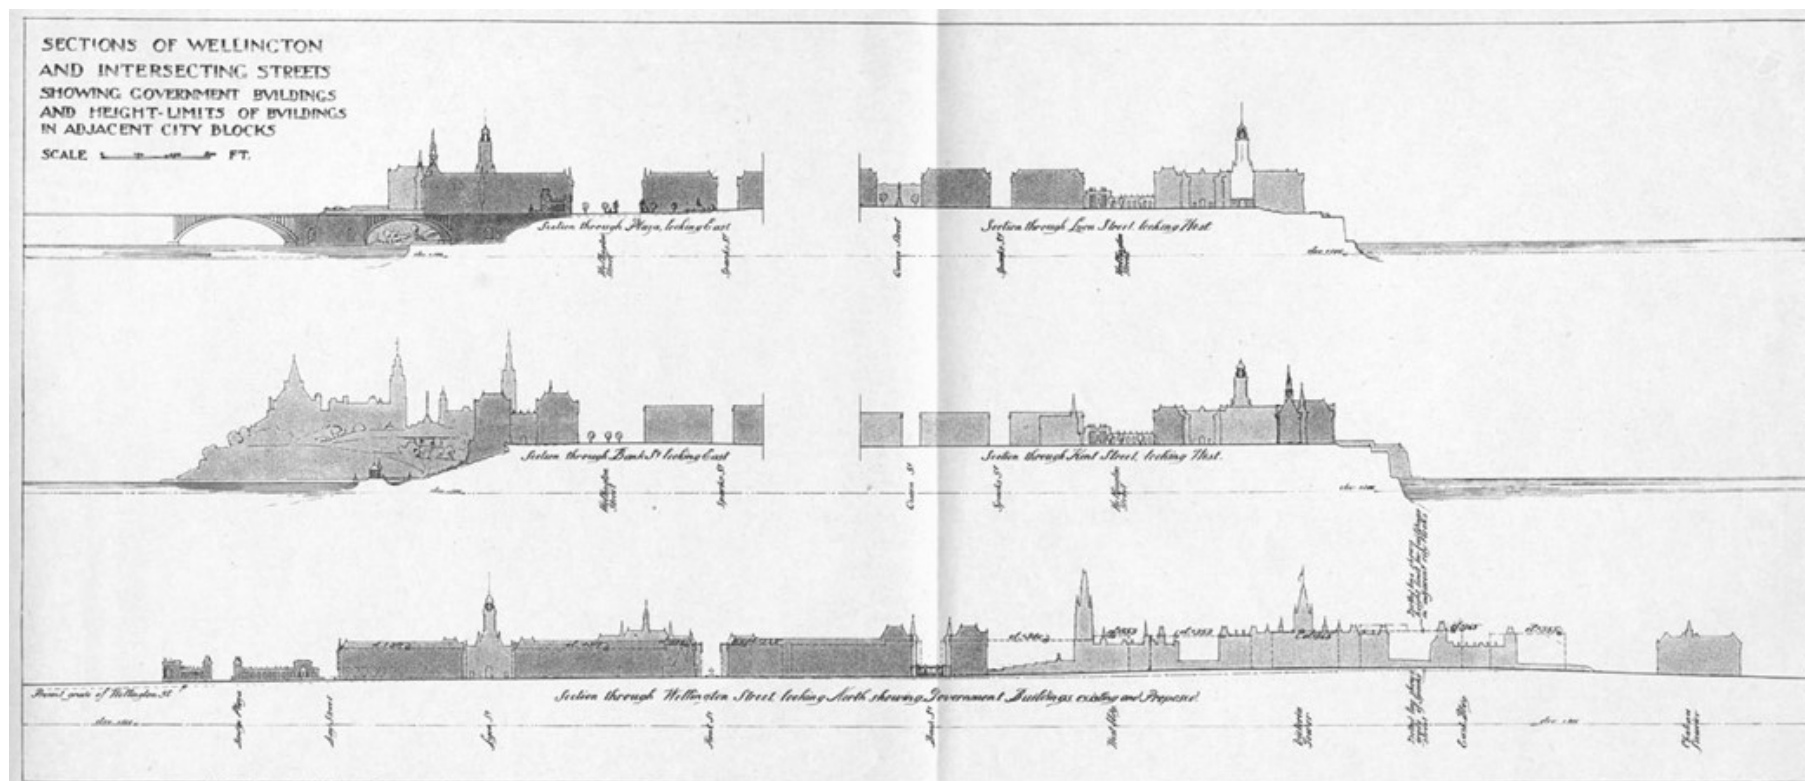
Proposed building height restrictions, demonstrating that no building in the CBD should exceed the eavesline of Parliament Buildings (Bennett, 1915)
